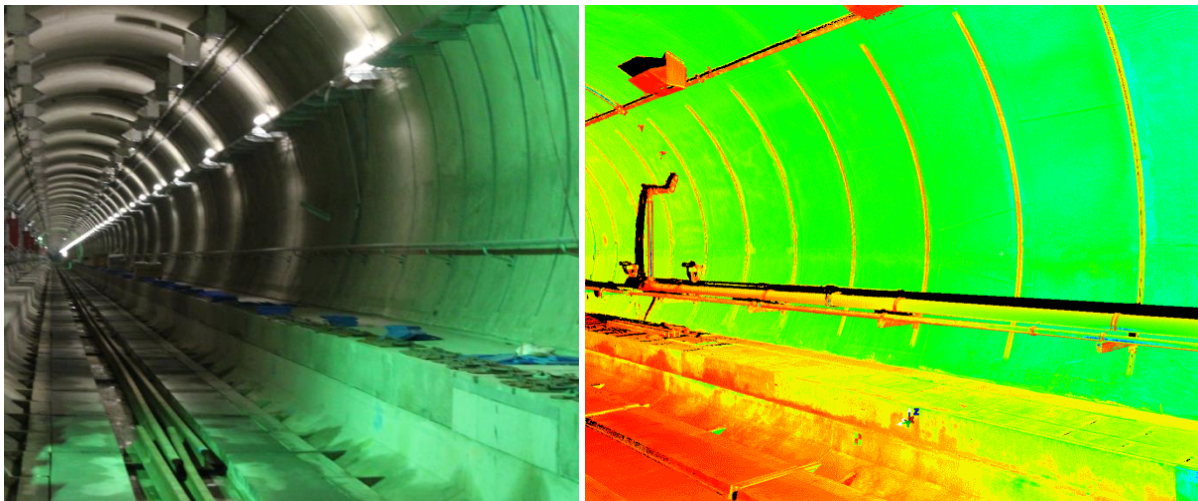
Image (left) and point cloud (right) of a tunnel surface, rail bed and installed piping
